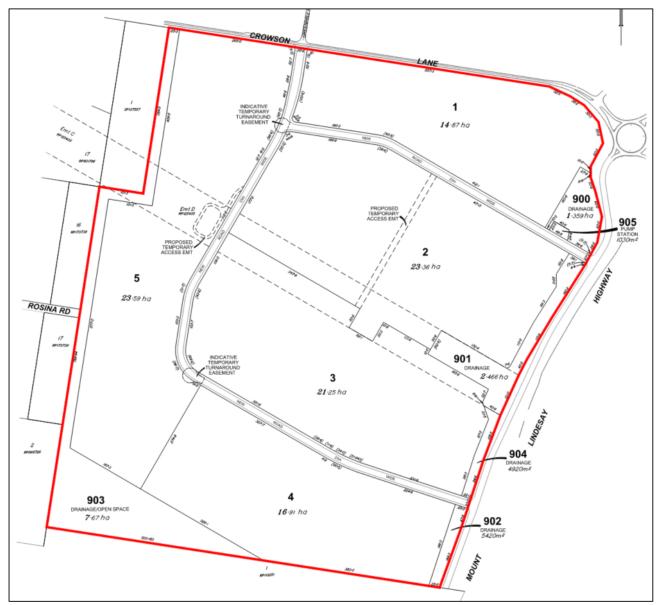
Proposed Amended ROL Layout (Source: Wolters, August 2023)
